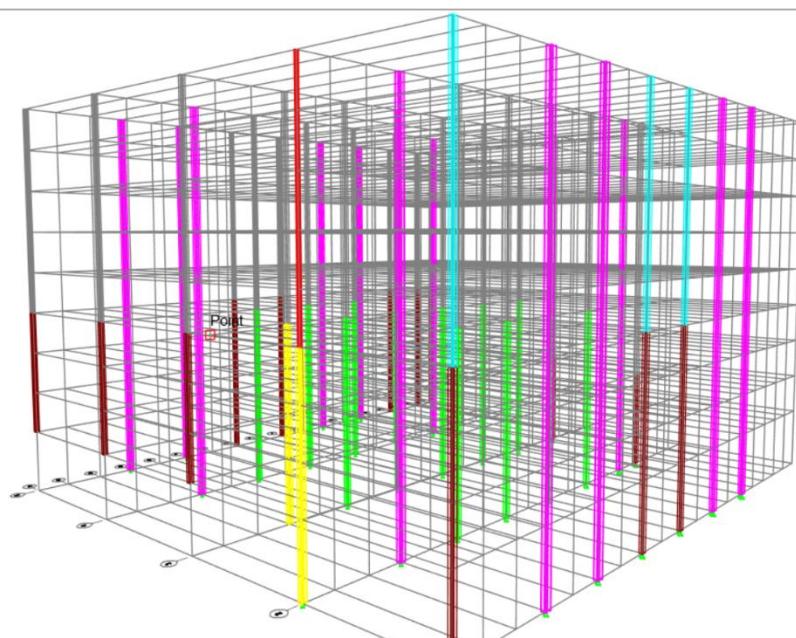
Figure showing the Proposed Column Sizes (Proposal 1)
